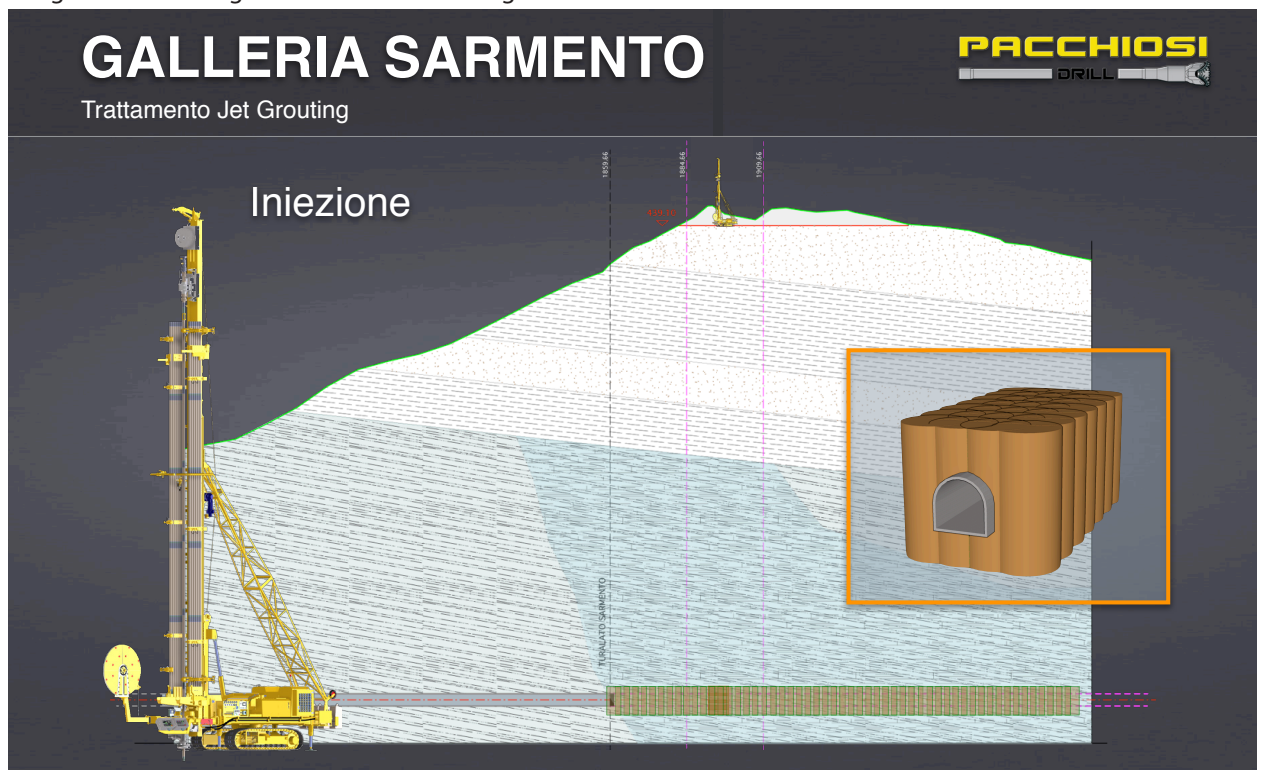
General longitudinal section showing 3D modeling of Jet Grouting columnary treatments
